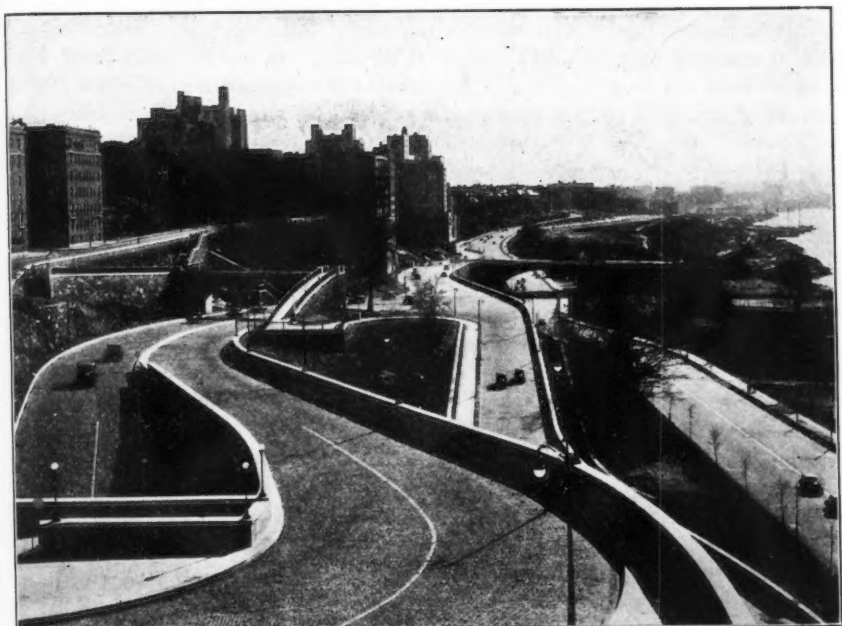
VIEW OF APPROACH CONNECTIONS TO RIVERSIDE DRIVE, LOOKING SOUTH FROM MAIN ROADWAY.
